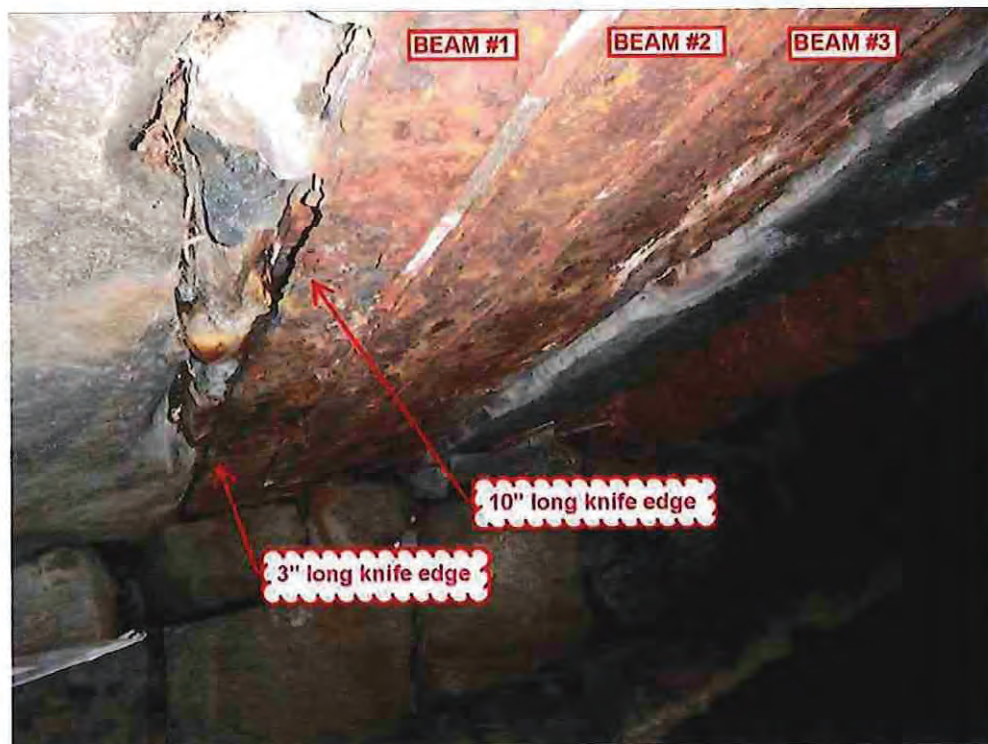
Girders/Beams - Span 2, Granite Slab #10, split section at northwest corner.
